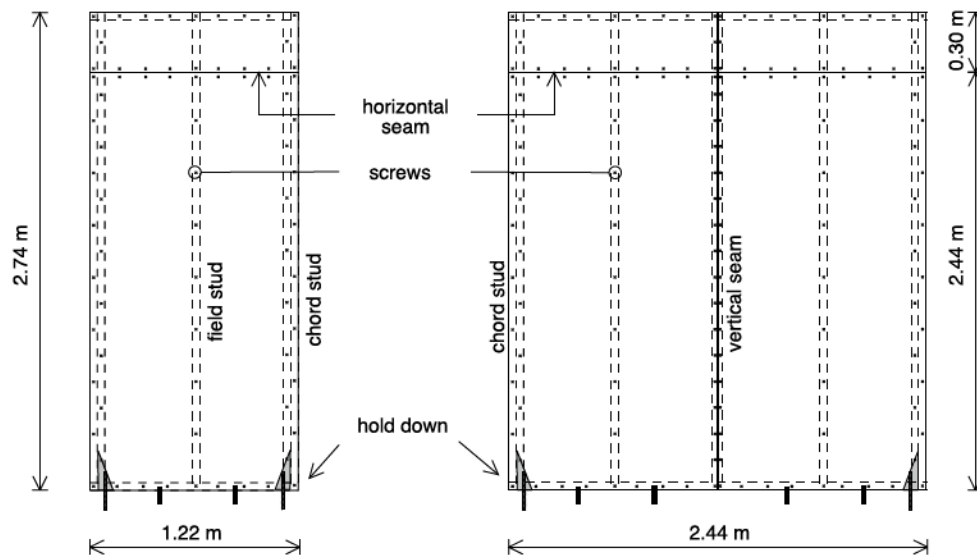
Two shear wall configurations of Liu et al. CFS shear wall tests: 1.22 m width and 2.44 m width
